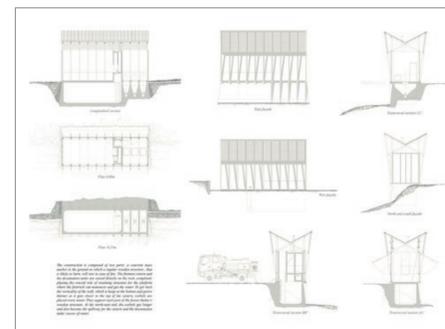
Technical drawings of the firemen cistern, plans, sections and elevations.
